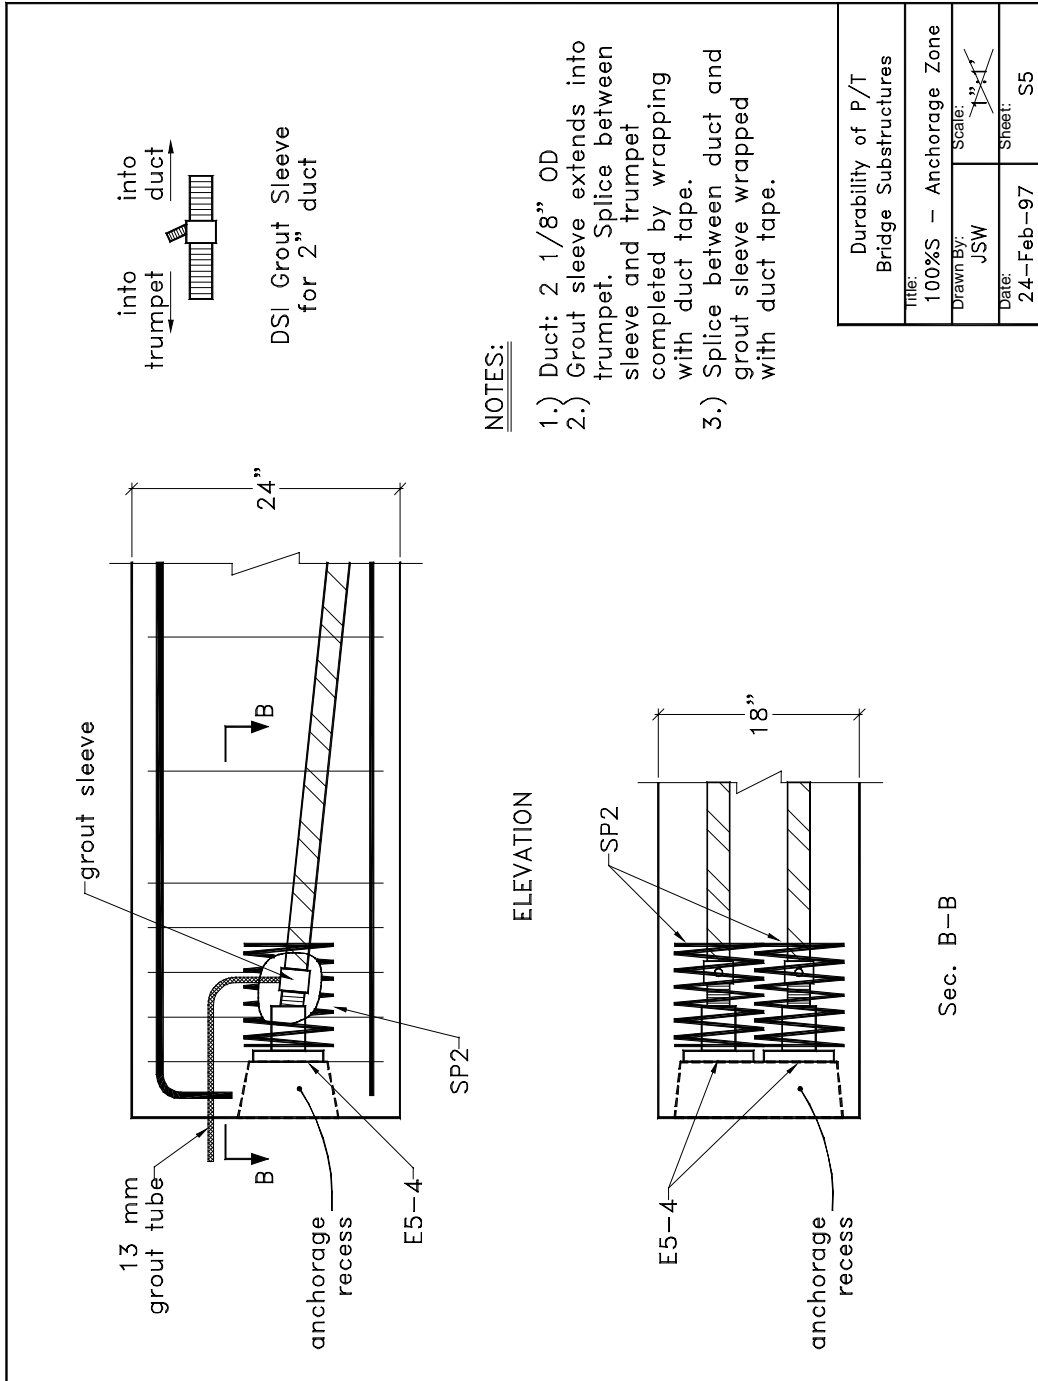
Sheet S5: 100%S Anchorage Zone
